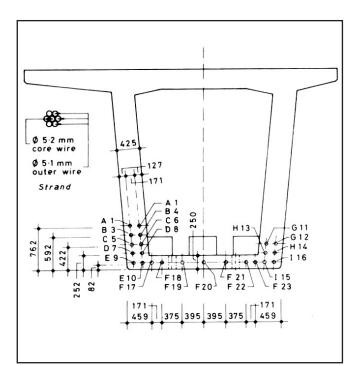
Cross section of the box girder showing cable location at the centre of the span
